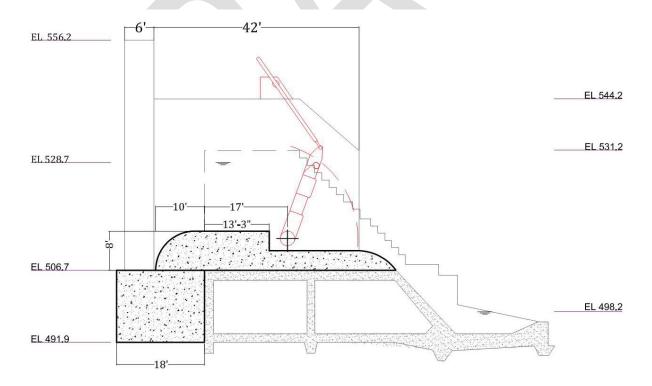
TP-3 (Lake McQueeney) Spillway Section
